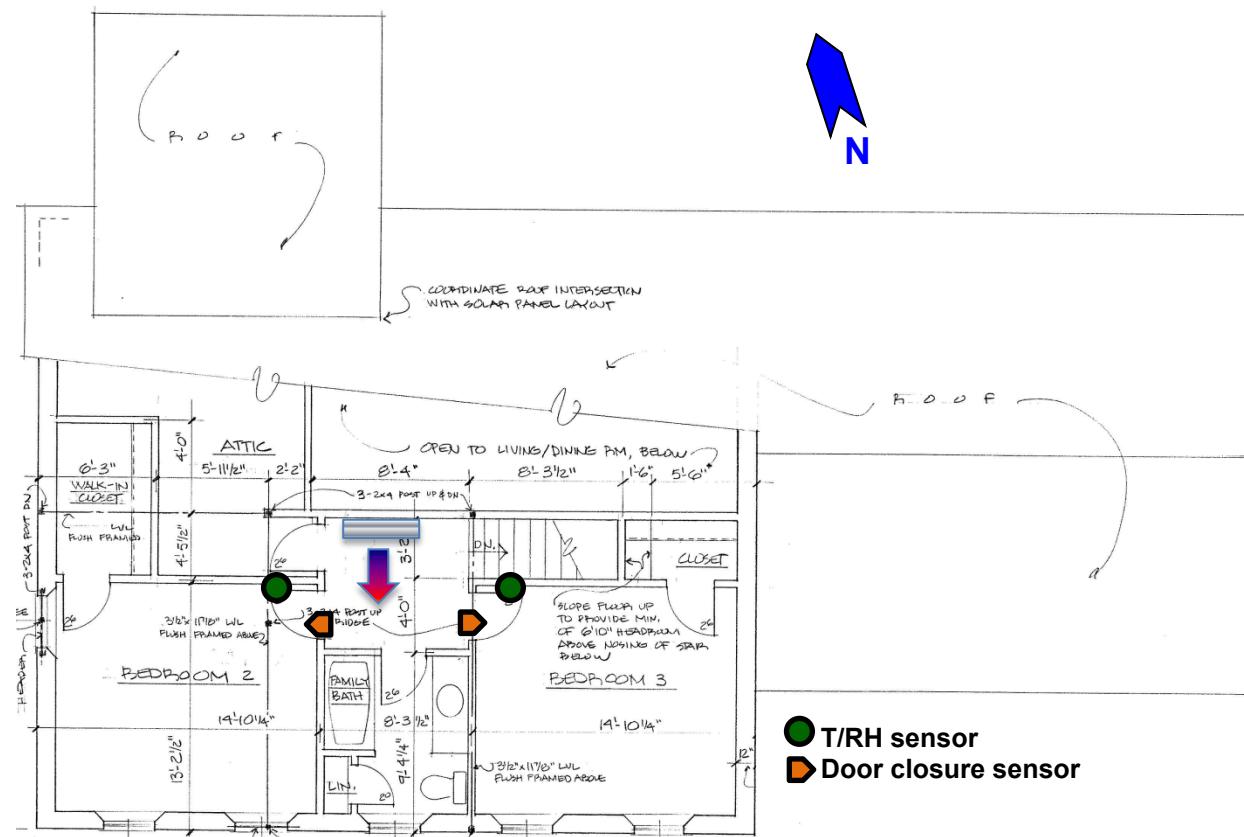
Devens Lot 7 floor plans, MSHP locations, monitoring locations
